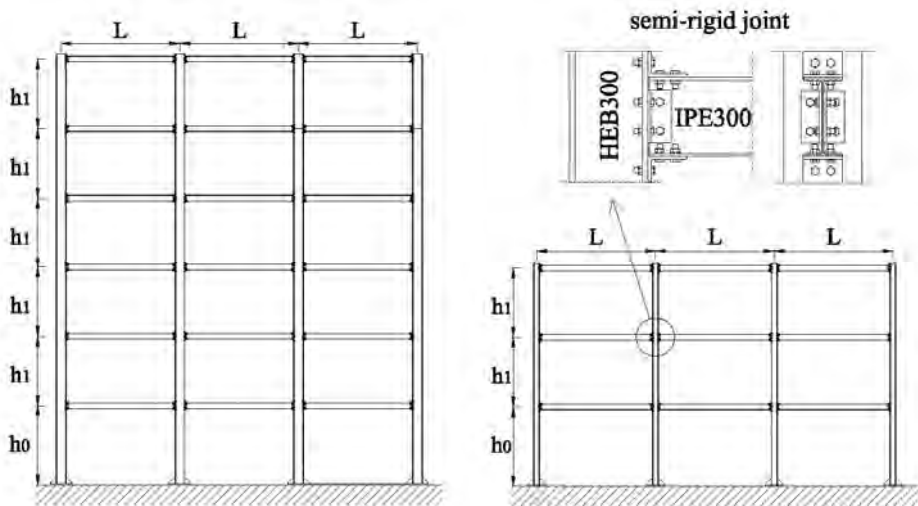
Elevation of the 3F and 6F bare frames together with beam-to-column connection details.
